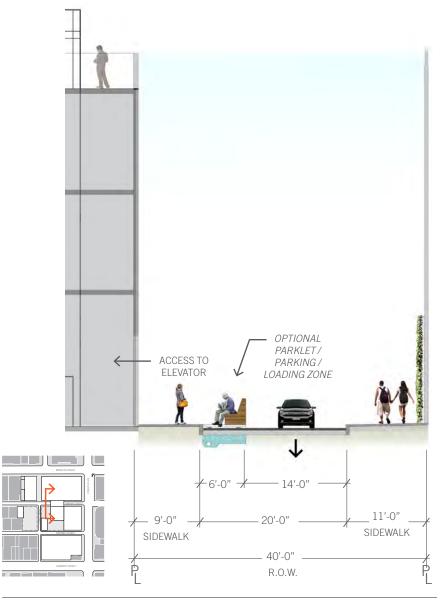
Section: Elevator Access to Rooftop (at Minna/Mary Street)
